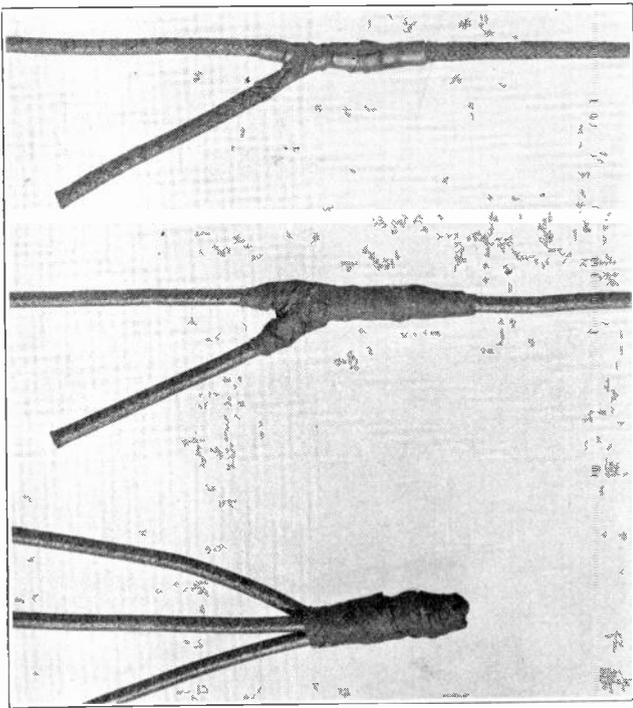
The upper view shows a "tap" splice covered with rubber tape. The center and lower views show "tap" and "pigtail" splices completely taped with both rubber and friction tape.
